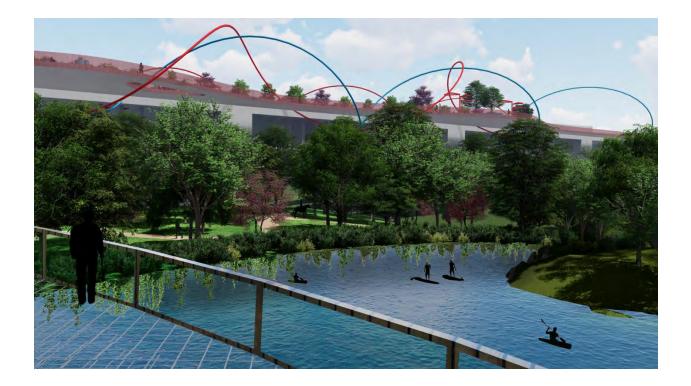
Canopy Walk Platform Overlooking the Land Bridge Crossing the Trinity River (Adapted with Lumion)
